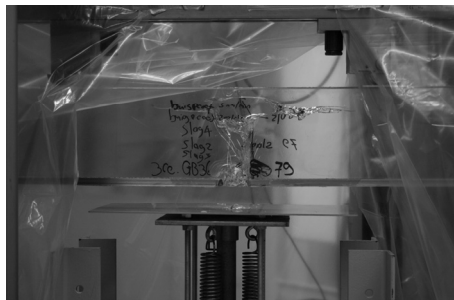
Typical final failure in 3re.GB368.A specimen (after resistance test on specimen with model level III damage).
